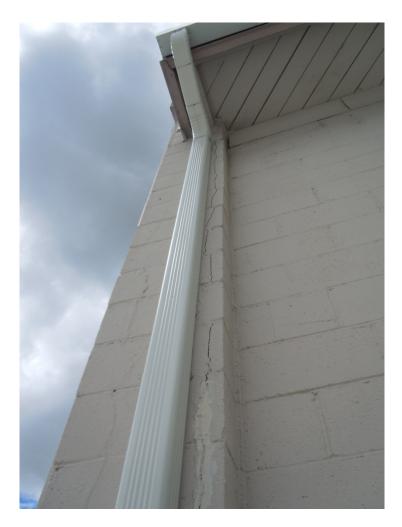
Vertical Cracks at Southeast Corner of Gymnasium
